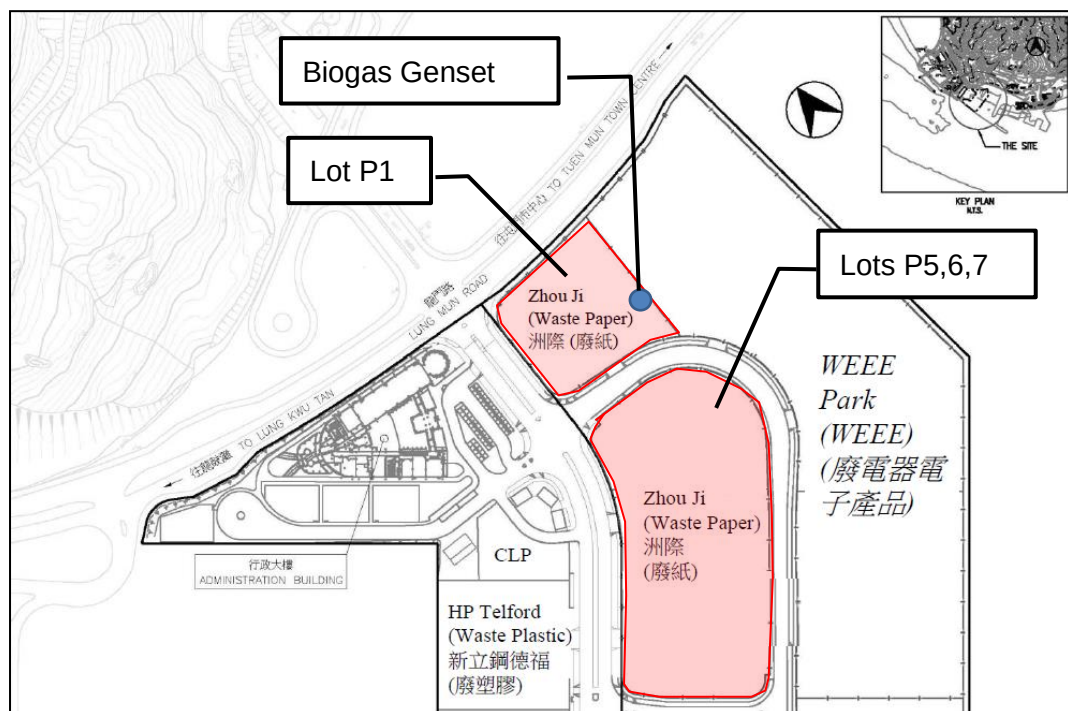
Layout Plan for Paper Pulping Plant and Waste Water Treatment Plant in Tuen Mun EcoPark
